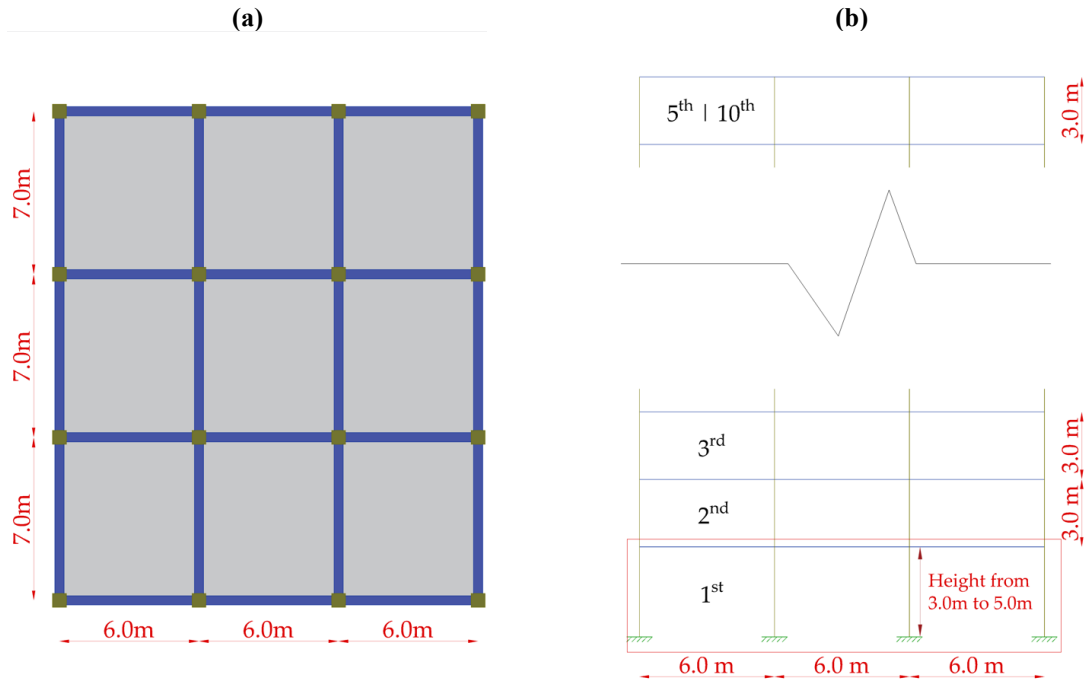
Frame building system configurations: a) Plan view; b) 5/10-storey building cutaway
